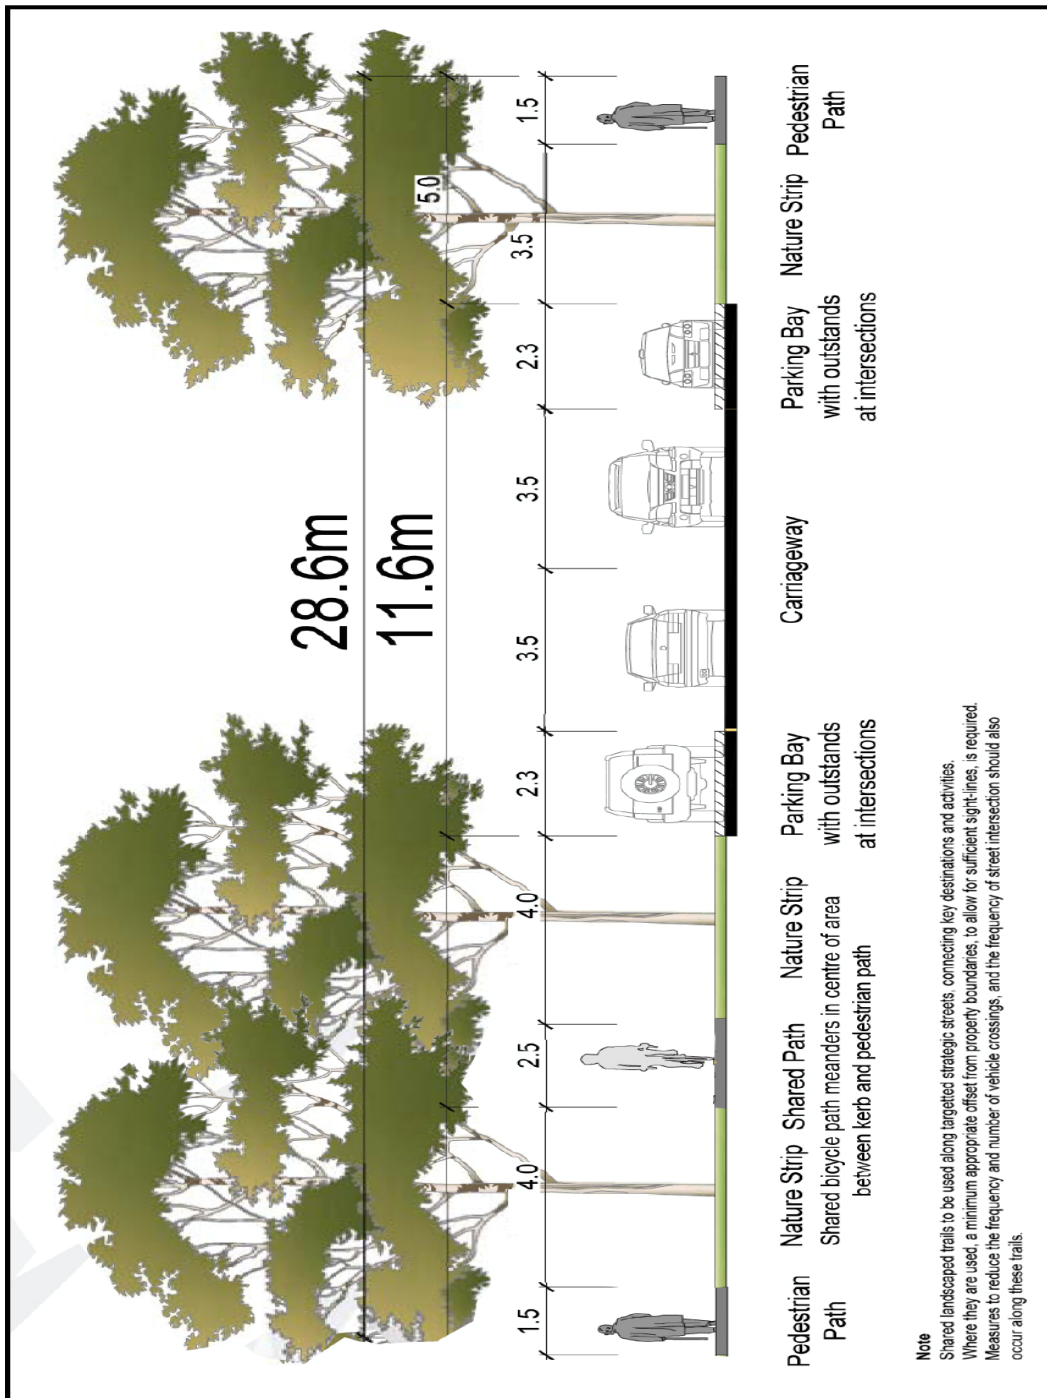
Carriageway Cross Section Profile (Painted Hills Road and linear open space link)
